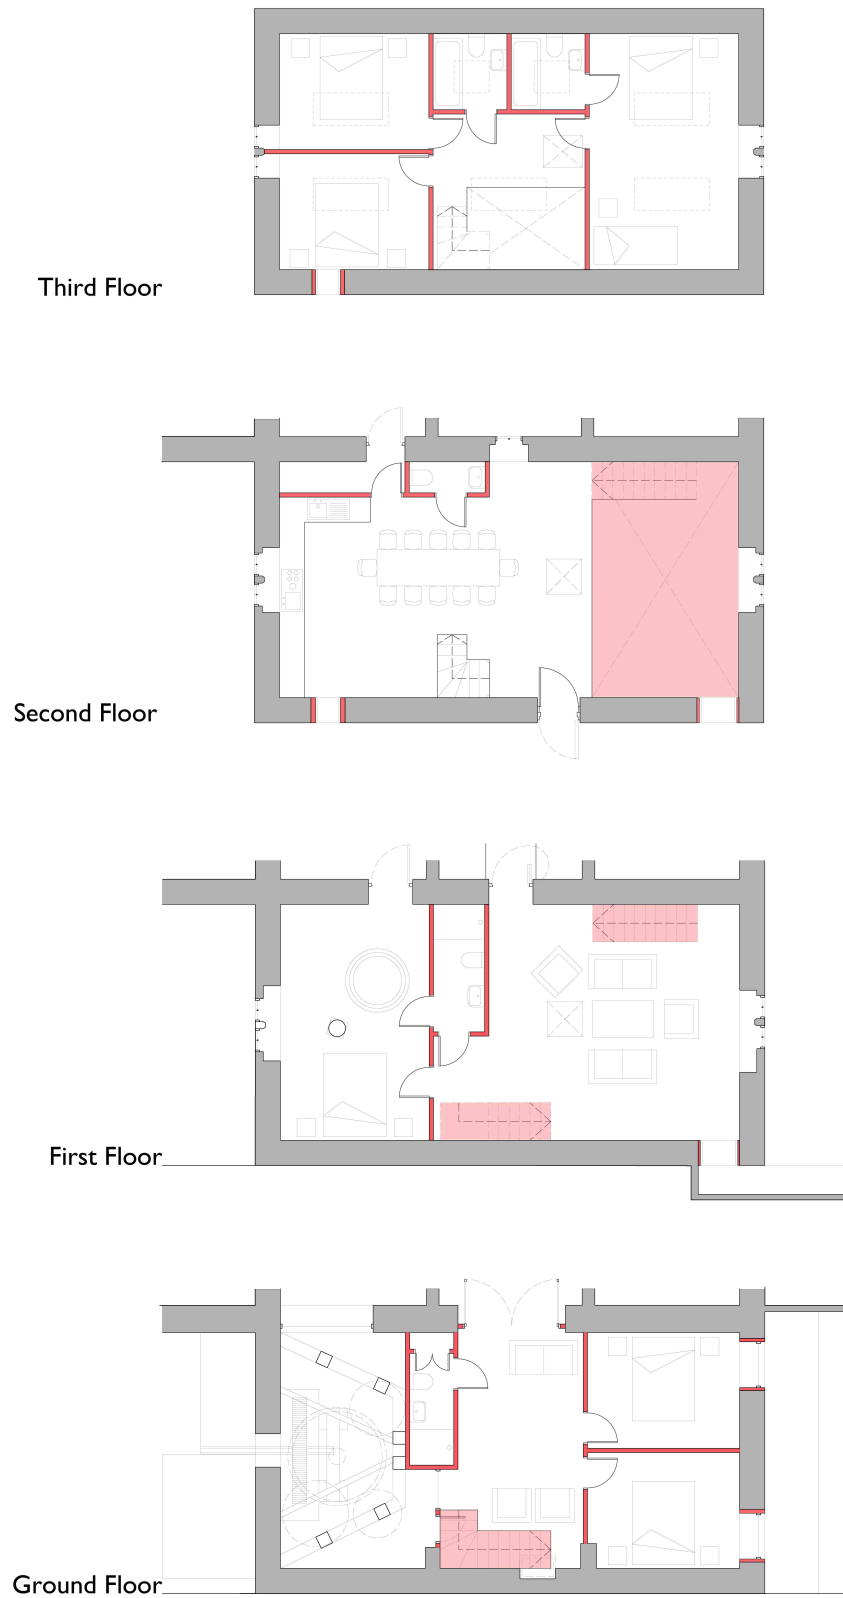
Floor plans with proposed alterations to internal layout highlighted in pink.
